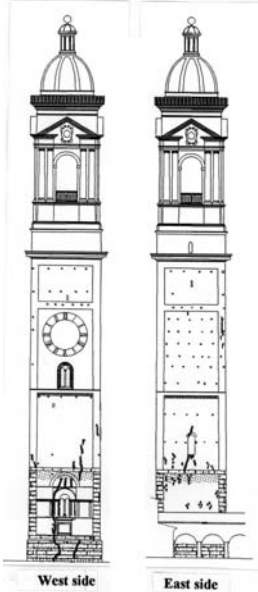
Drawing of the crack pattern in a bell tower
